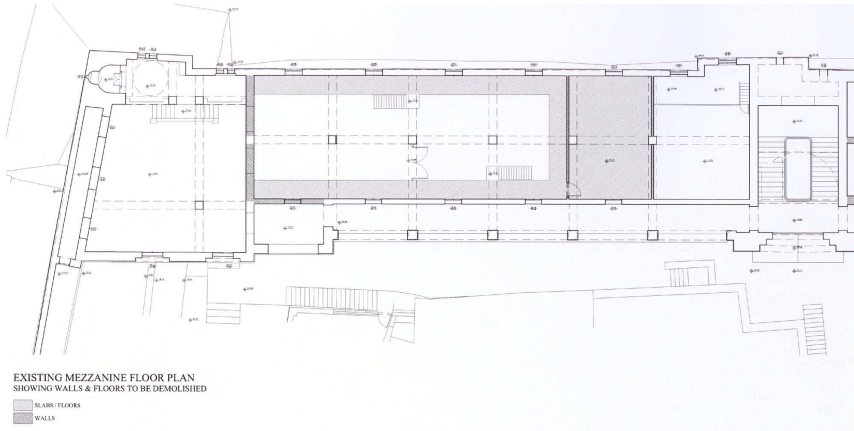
Plan of mezzanine library floor, Mezzanine floor shaded. From left to right: manuscript shelving, new finds room.
